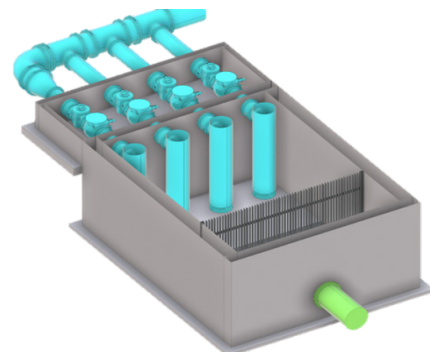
Stormwater Pump Station Rendering. GFT designed the wet well structure for the Trails End Stormwater Pump Station.
